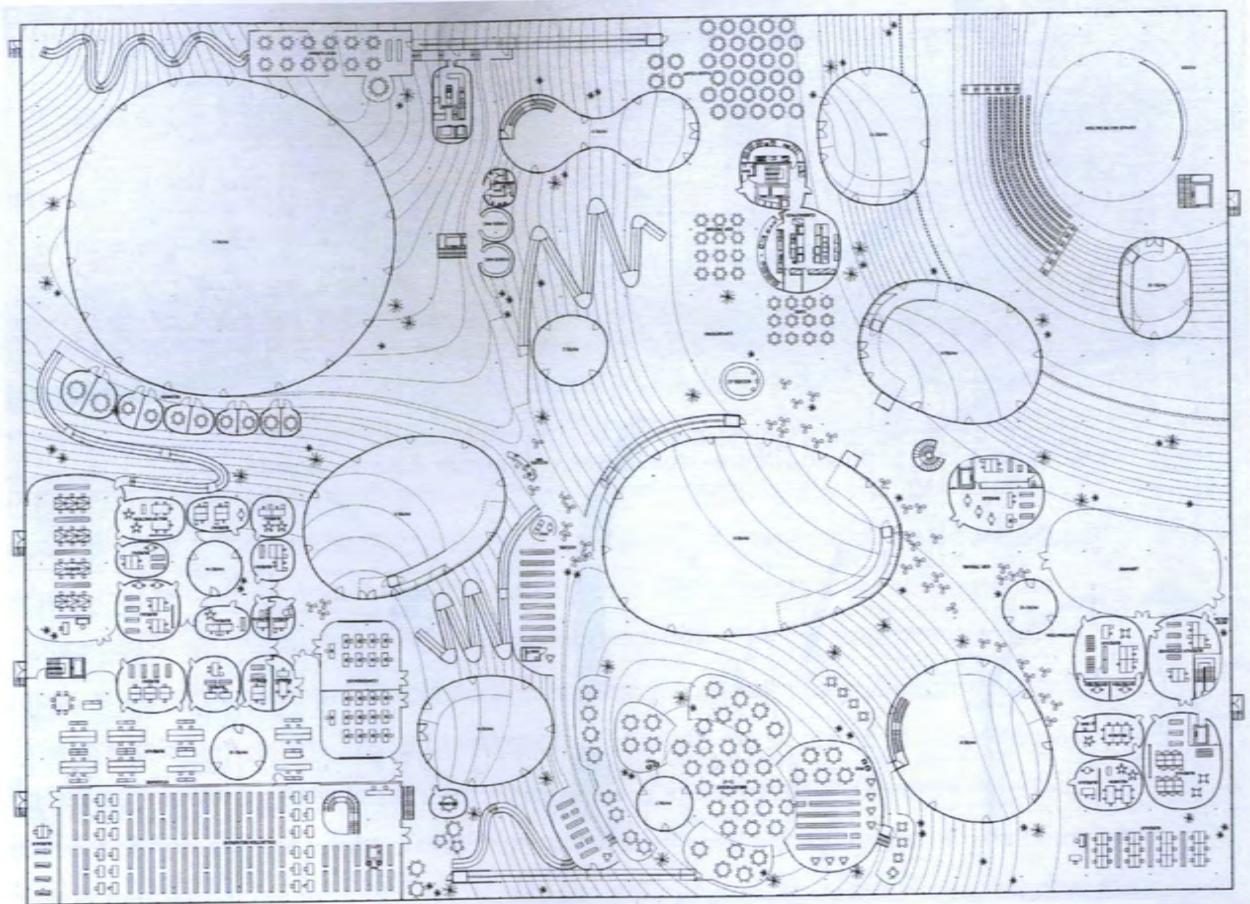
EPFL Learning Centre- Overall floor plan (Source: Sejima, 2008, p.182)
